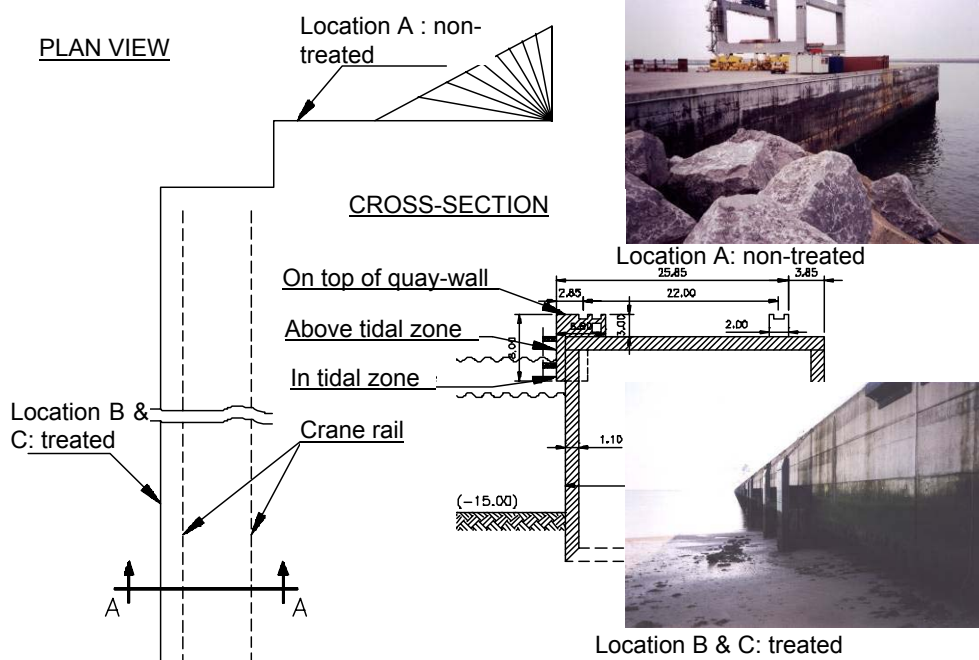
Plan view and cross section of the quay-wall at Zeebrugge Harbor
